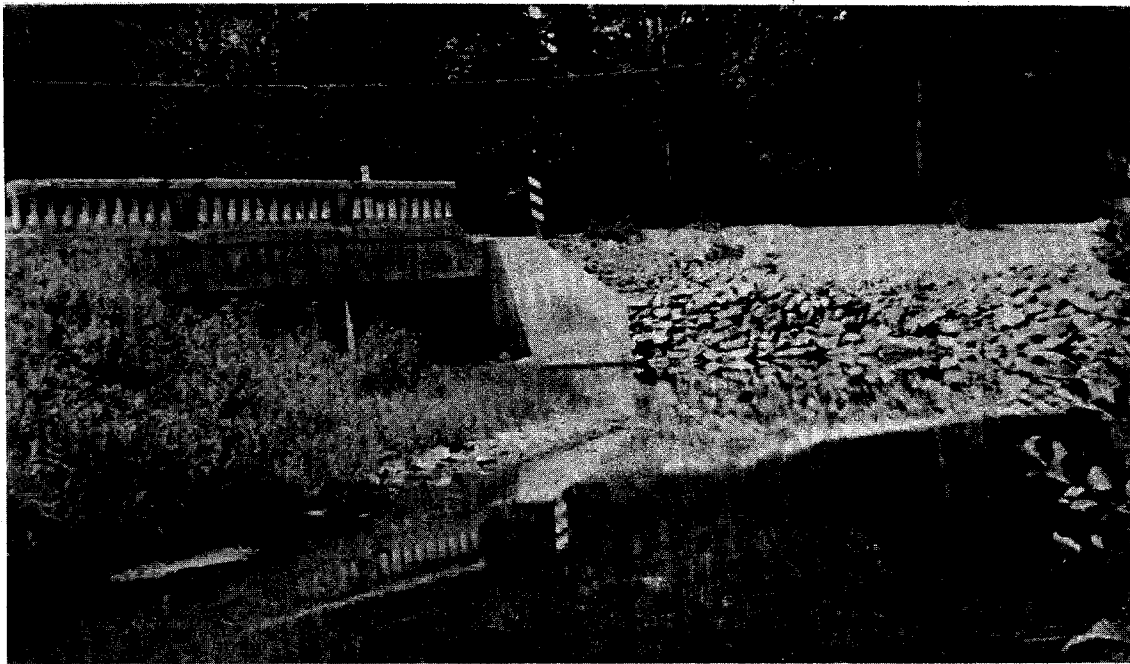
Downstream view of riprap retaining wall at SR-38 bridge in July, 1976.
